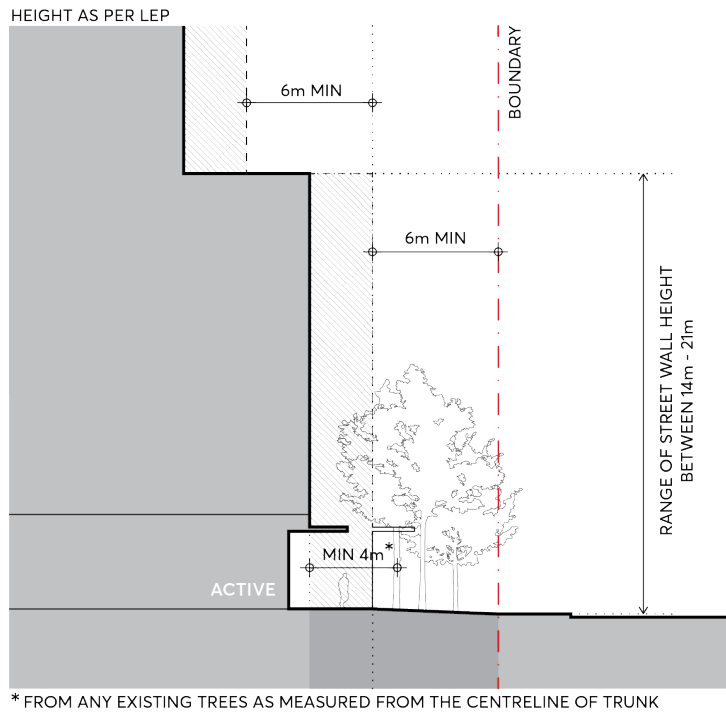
Great Western Highway (Section C) Setbacks and Street Wall Height
